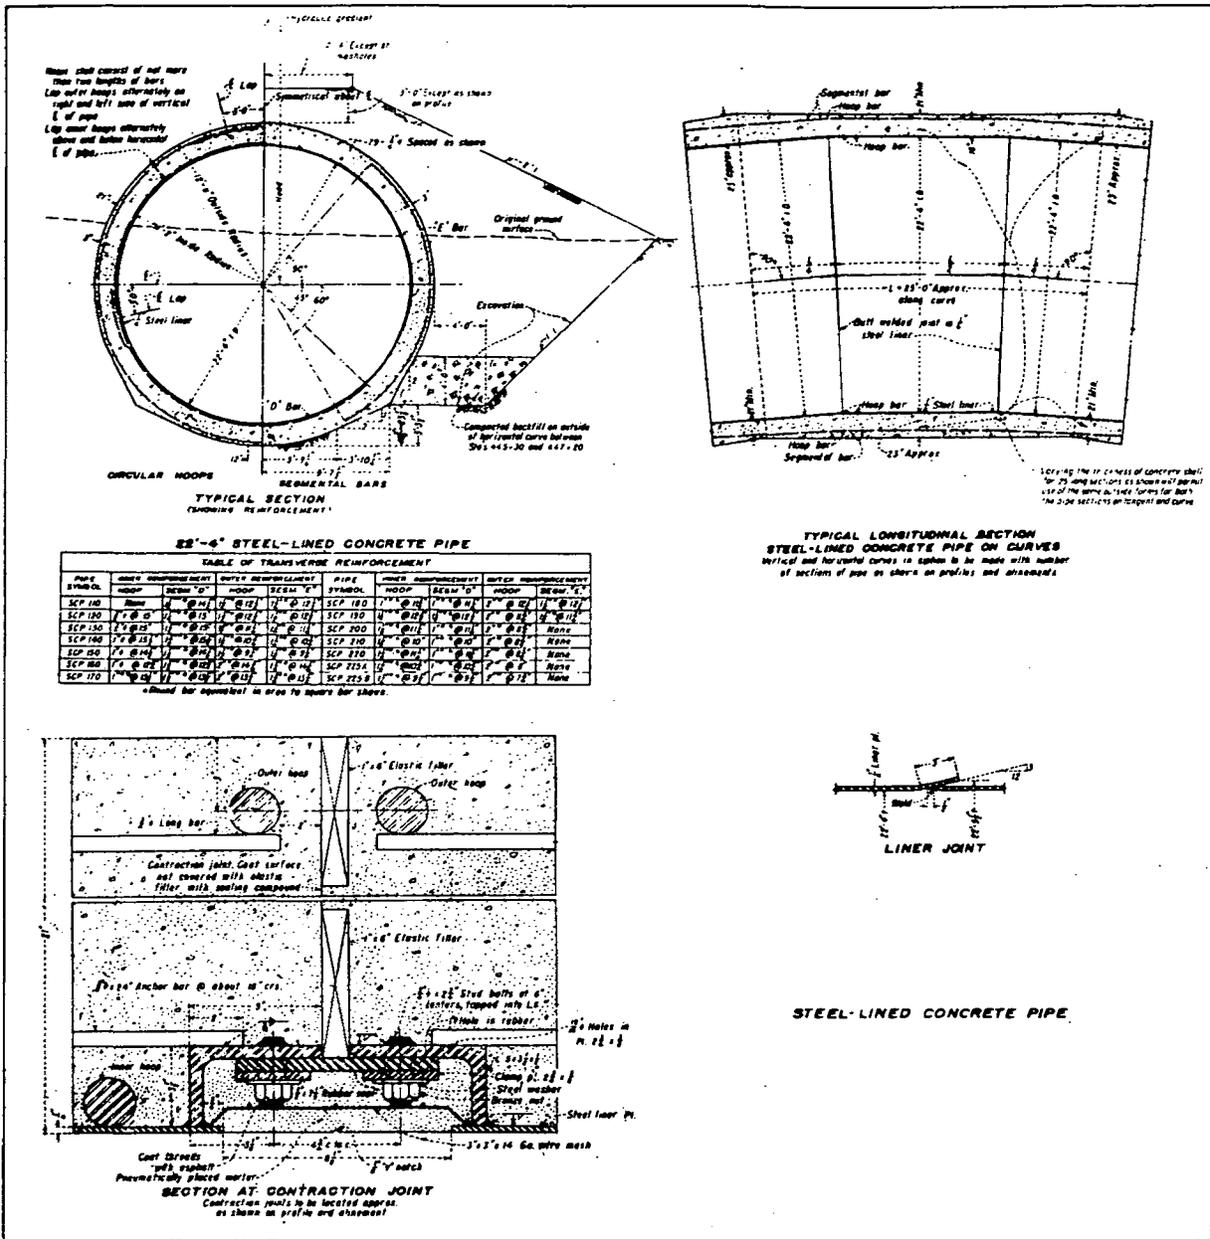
Steel-lined reinforced concrete pipe forms the central portion of the siphon, where the hydraulic head exceeds 100 feet.
